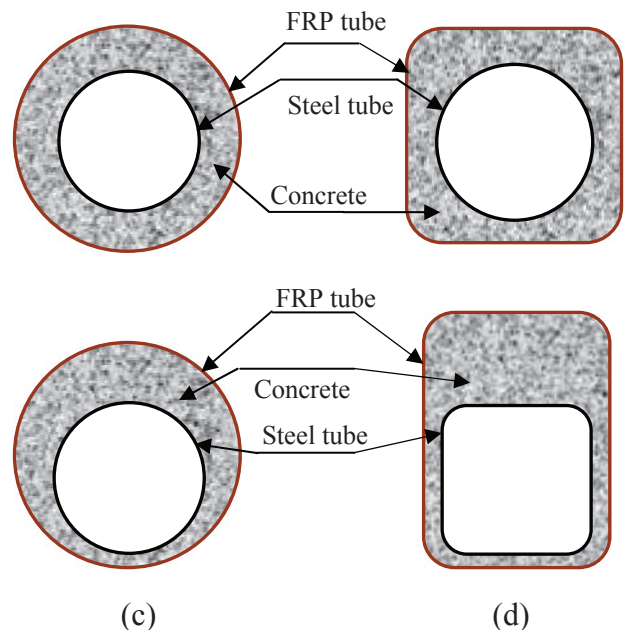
Typical double-skin tubular member (DSTM) cross-sections. (Drawing courtesy of Professor J.-G. Teng)
